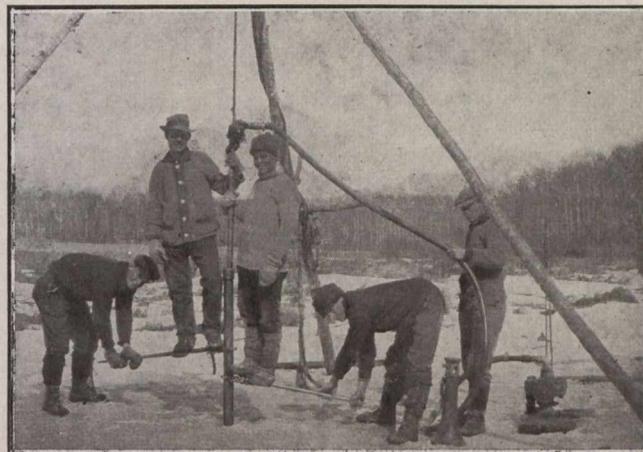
Showing Method of Rotating and Sinking the Casing.
